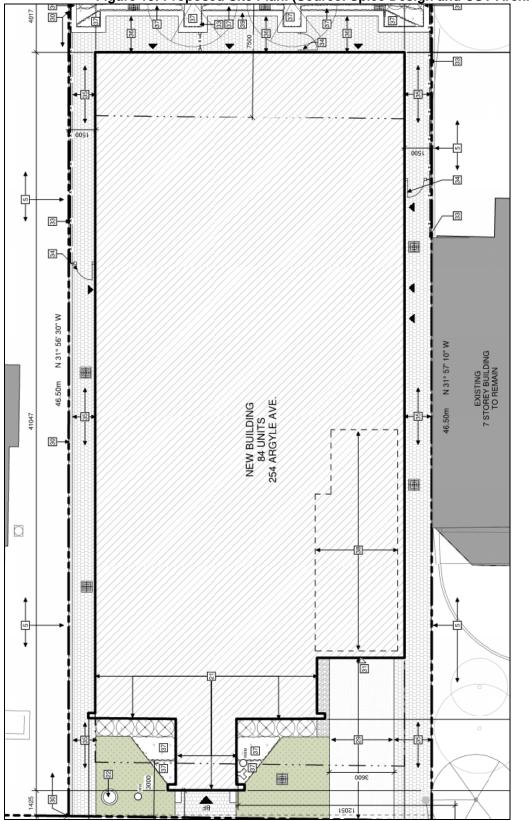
Proposed Site Plan. (Source: Spice Design and CSV Architects).
